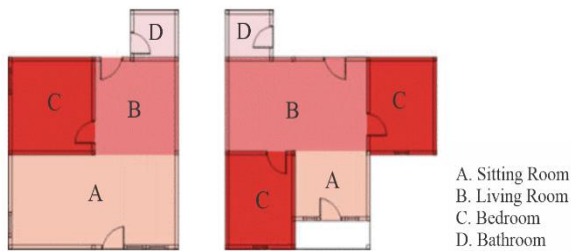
Huntap House Plan. 1 bedroom floor plan (left), 2 bedroom floor plan (right)
